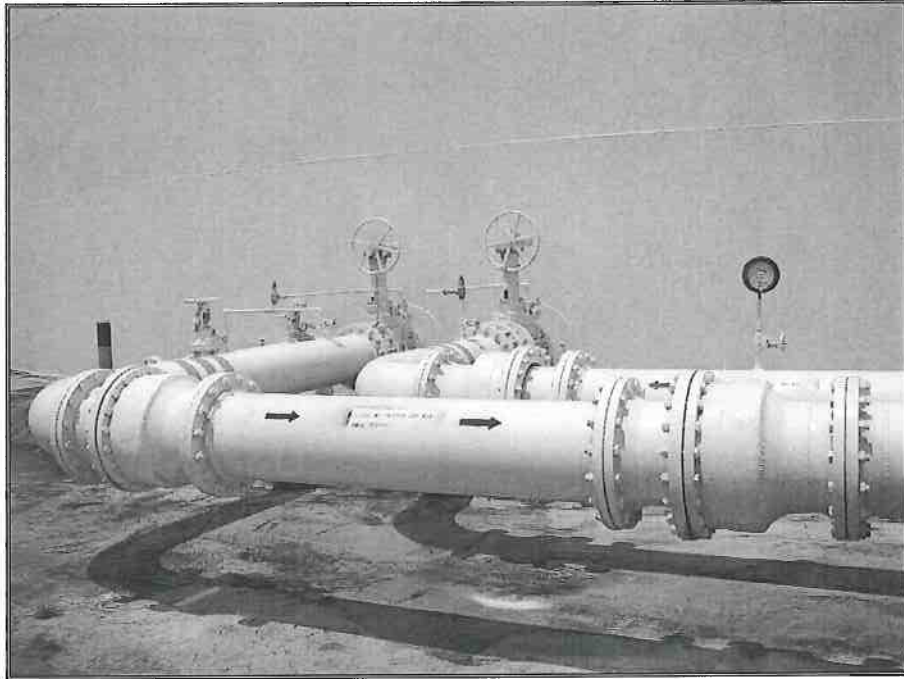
Test No. 13 JP-5 Tank 2270
